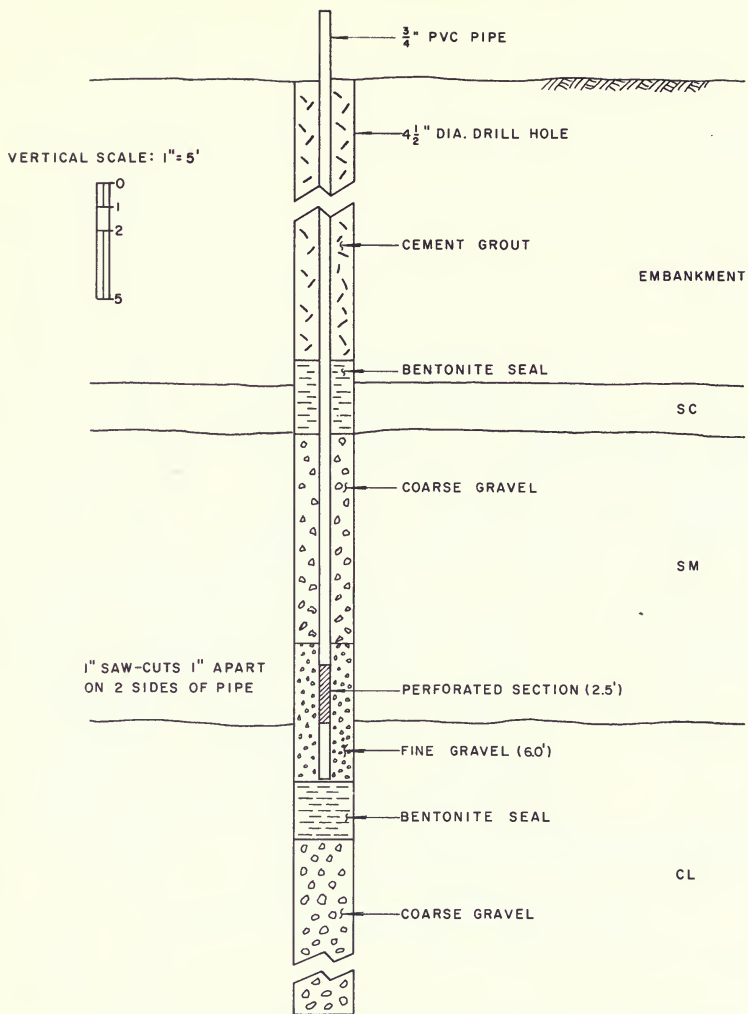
Typical Standpipe Piezometer Installation at Thermalito Forebay Dam Between 1976 and 1984
